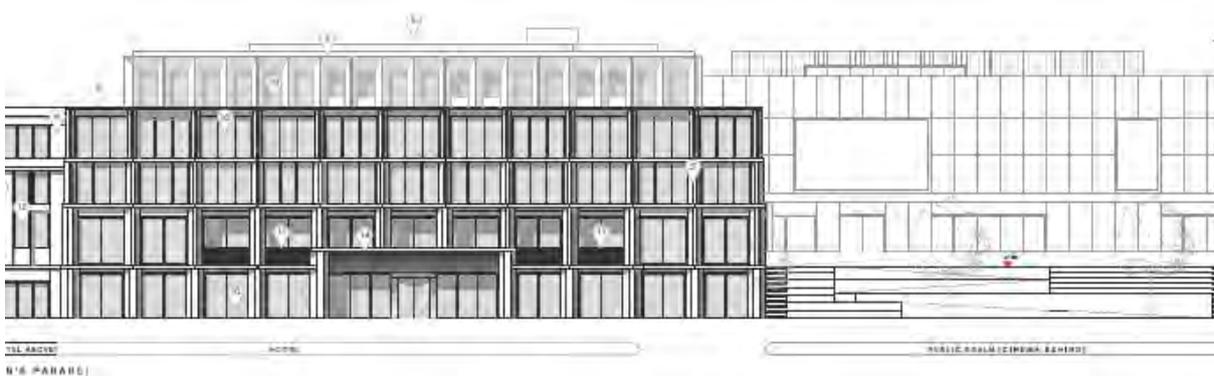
Amended Queen’s Parade elevation showing reduction in height of roof plant
